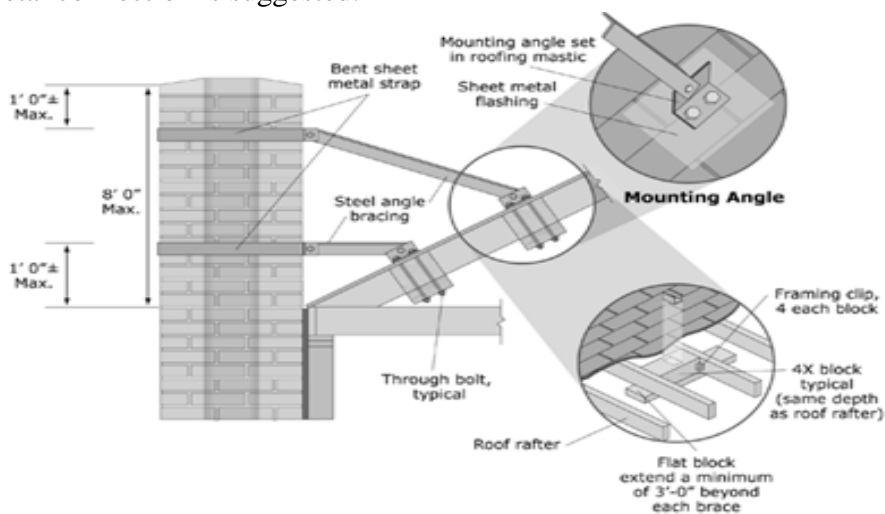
Typical brace configuration for chimneys FEMA E-74 [10]
